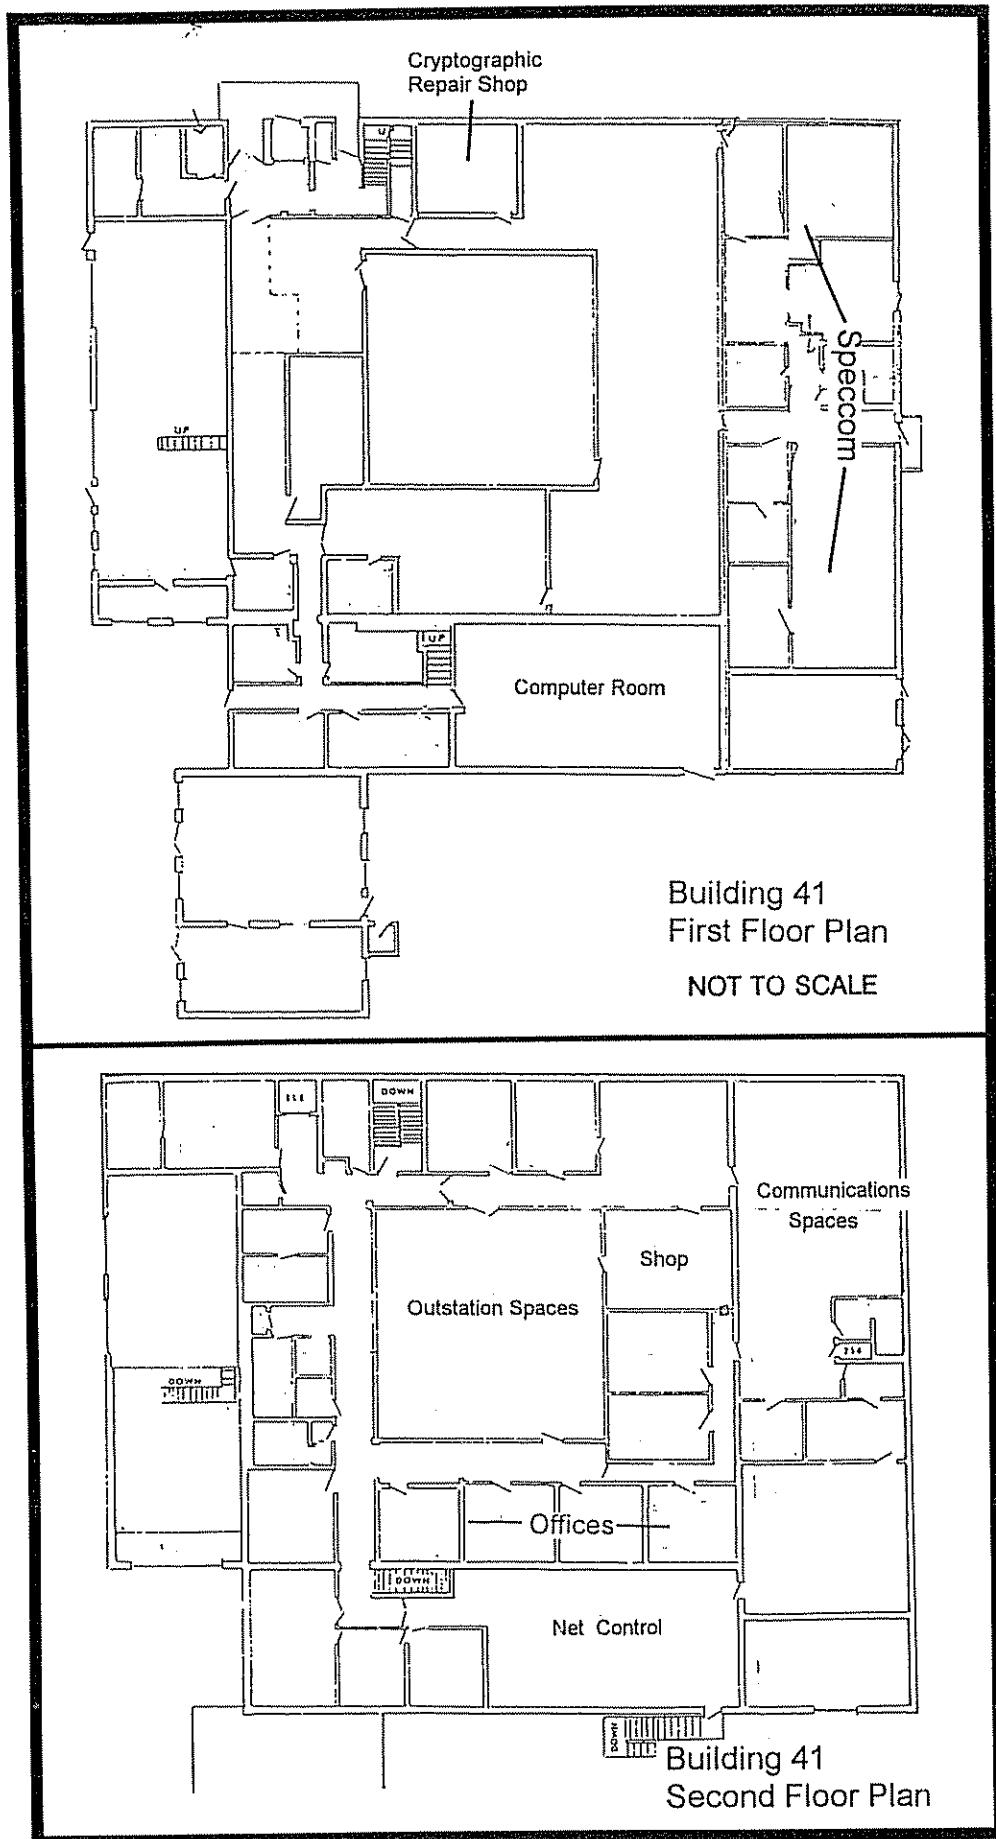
Above and below: First and second floor plans of operations building (Building 41) at NSGA Northwest (Courtesy of Operational Archives, Navy Historical Center).
